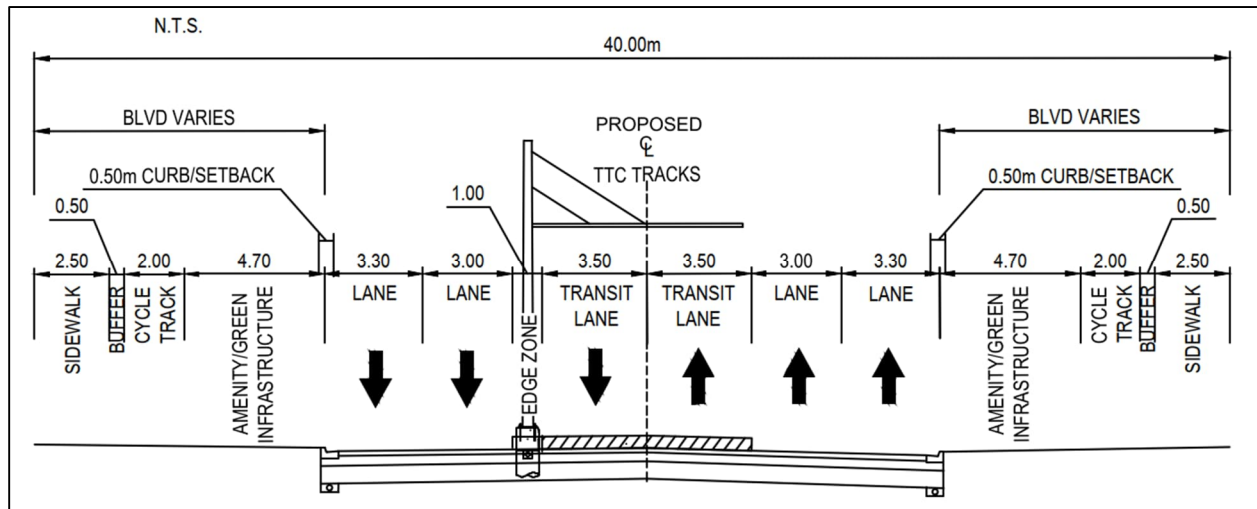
Lake Shore Boulevard West Improvements, East Intersection Leg at Legion Road – Typical Concept Cross-section
